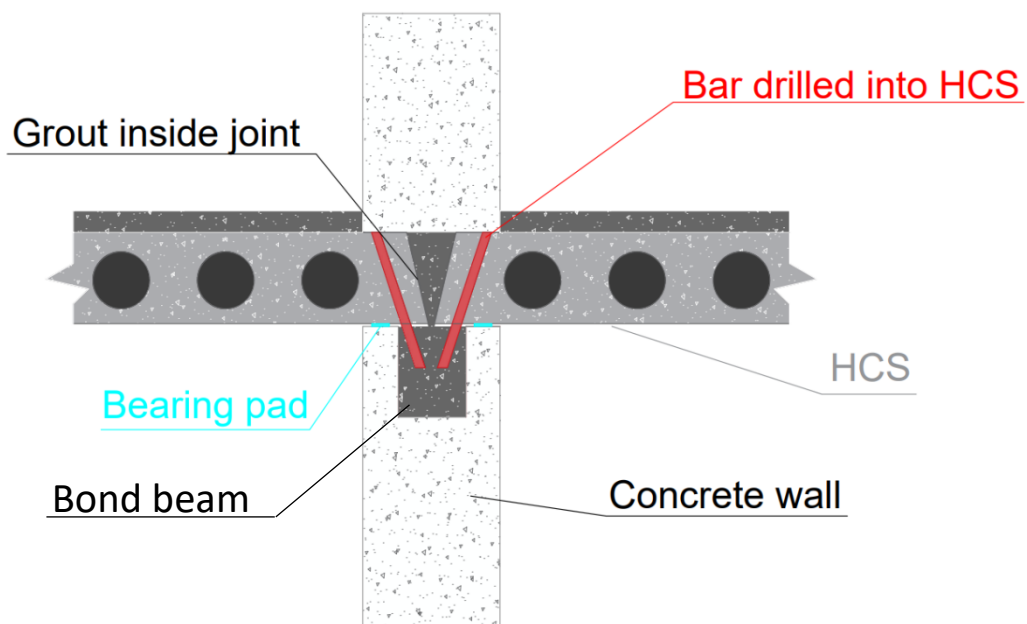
Illustration of HCS-Wall connection w/drilled bar
